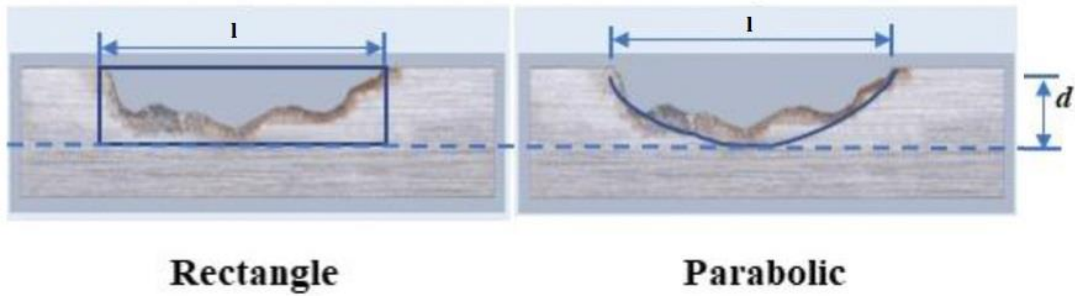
Geometric dimension of a rectangular and parabolic corrosion defect on pipes [43]
